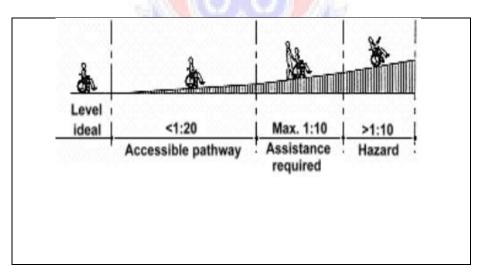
The recommended maximum slope of ramp (Source: SOLIDERE 2004)
